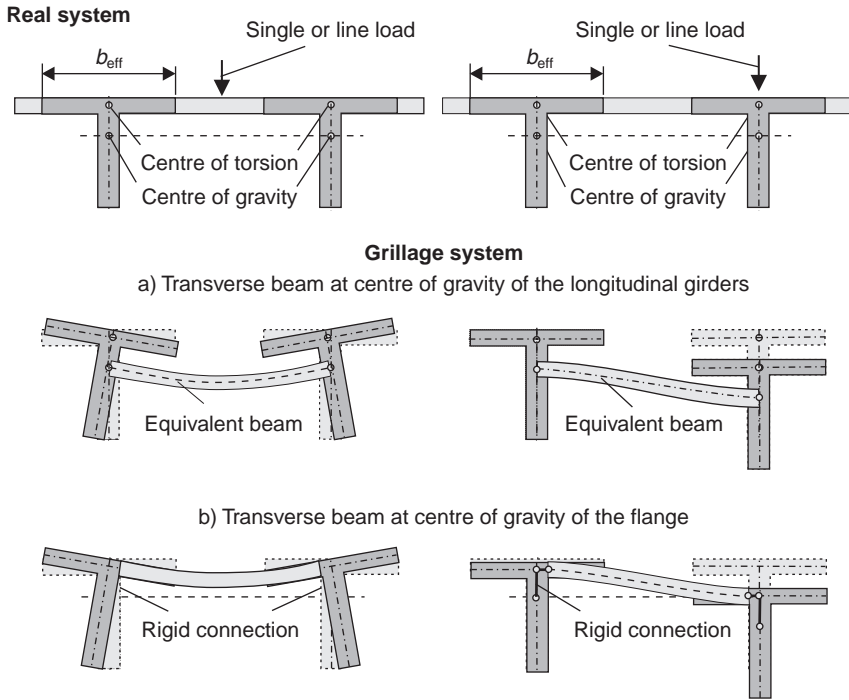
Deformation of the longitudinal and transverse beams under constant line loading
